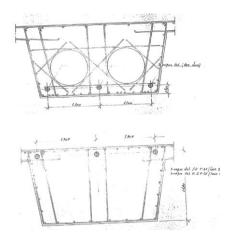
Designs drawings (longitudinal prestressing): half span section (top) and support section (bottom)
